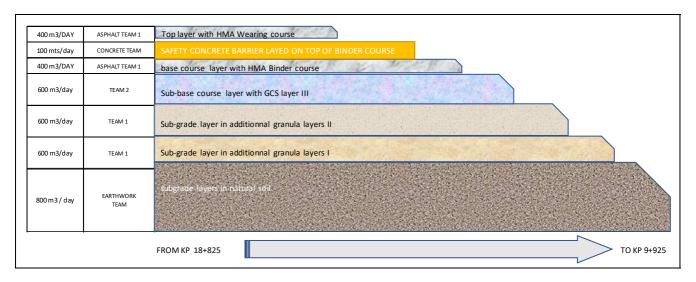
CROSS SECTION OF ROAD LAYERS
